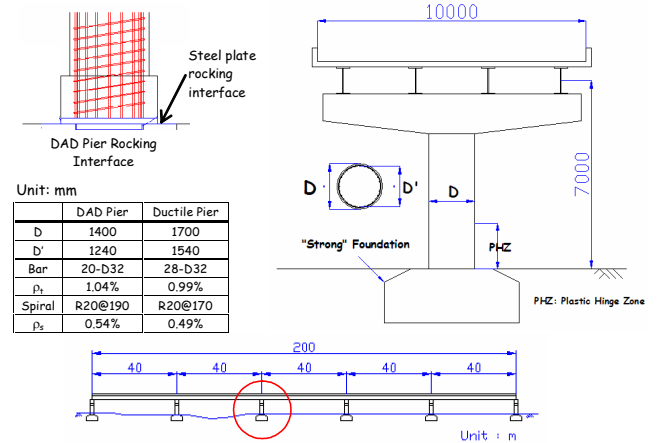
Prototype bridge and design details of the DAD and ductile piers.
